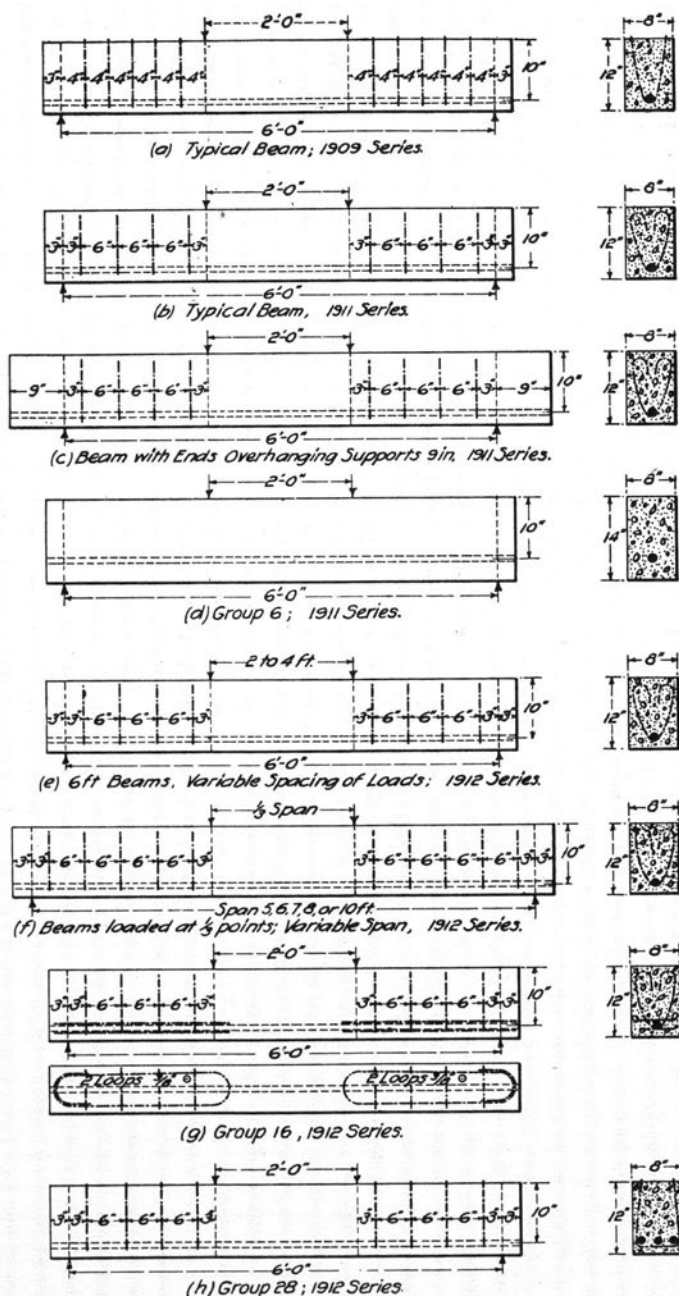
TYPICAL FORMS OF REINFORCED CONCRETE BEAMS USED IN THE TESTS.
